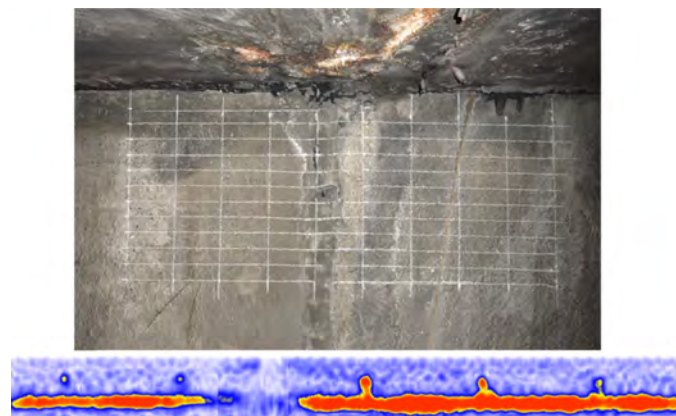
B-scan of precast divider panel showing backwall reflection and reinforcement.
